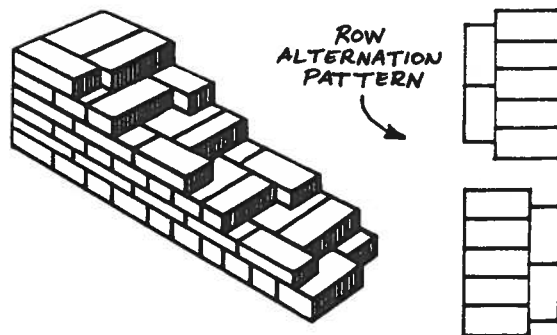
9: Method 1 for laying a 13 1/2" wall.
